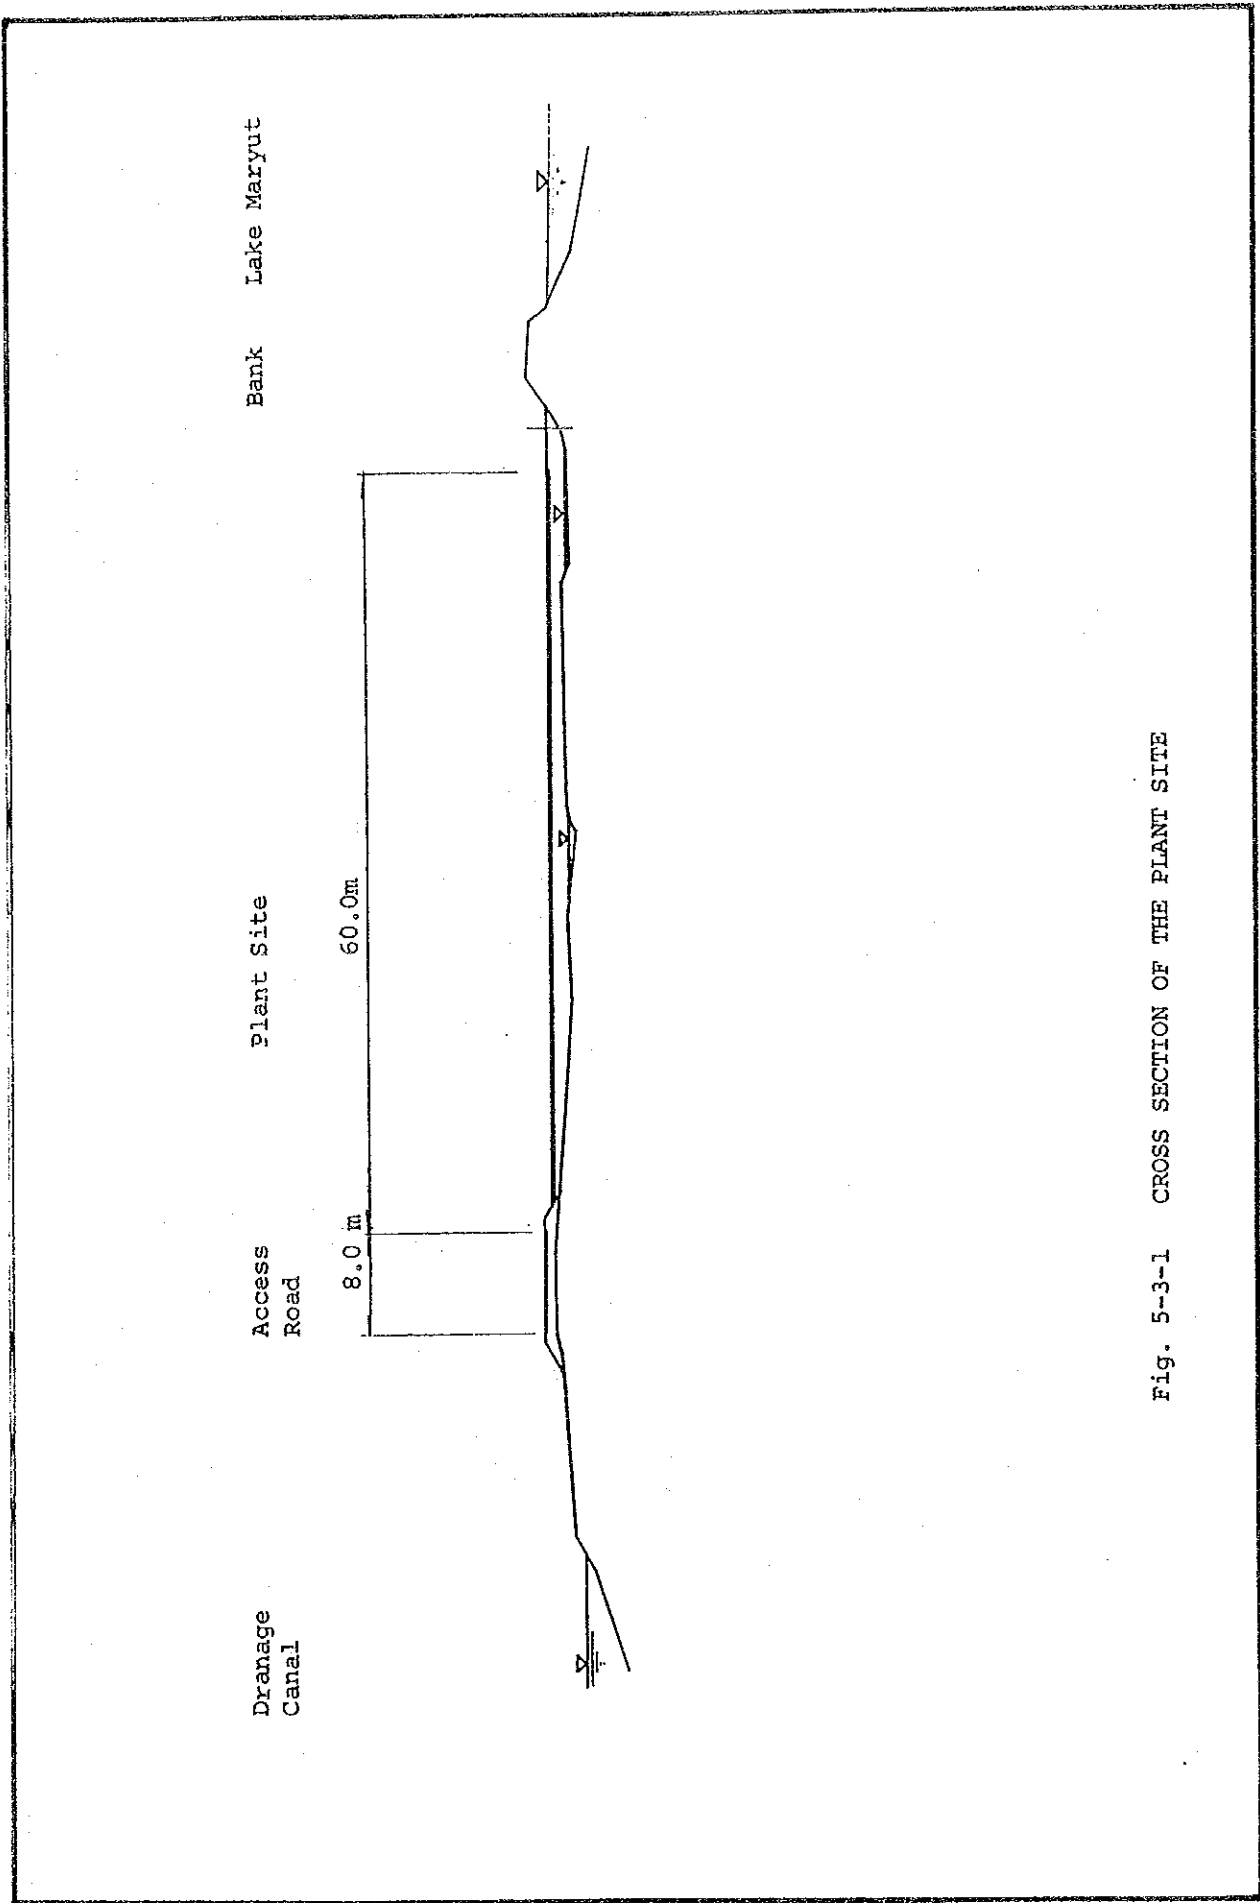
CROSS SECTION OF THE PLANT SITE
